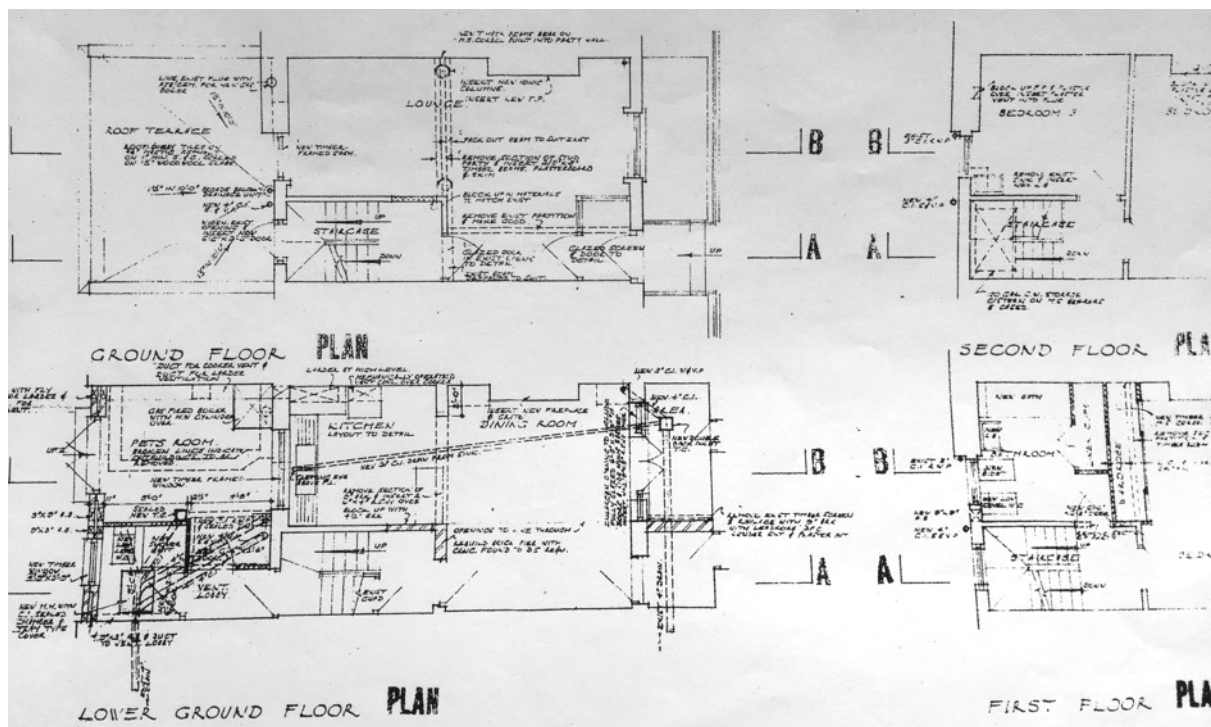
Plans showing alterations, 1965 (Camden Local Studies and Archives Centre)
